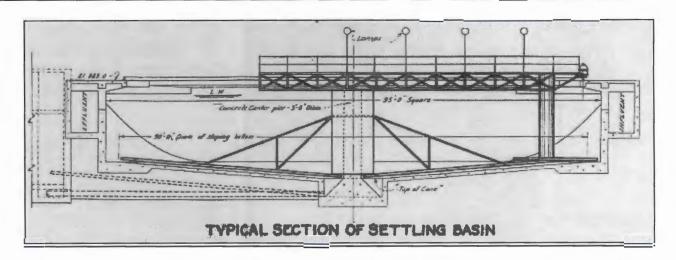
, "Purification and Pumping Works - Equipment & Mech Agitators Diagrams " Drawing 117, Bid Package No. 29; W. H. Dittoe, Chief Engineer, April, 1930 (partial view)
